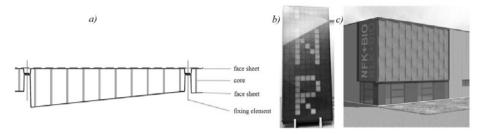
Facade element, horizontal sectional drawing (a), illuminated element (b) and reference object (c)
